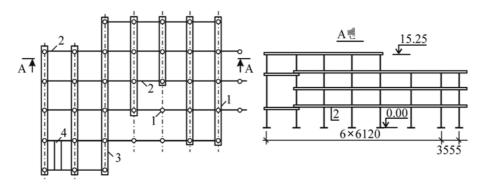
The layout of structures and the elevation drawing of a space framework: 1-composite column, 2-composite beam, 3-cast-in-situ reinforced concrete slab, 4-pre-cast concrete slab
